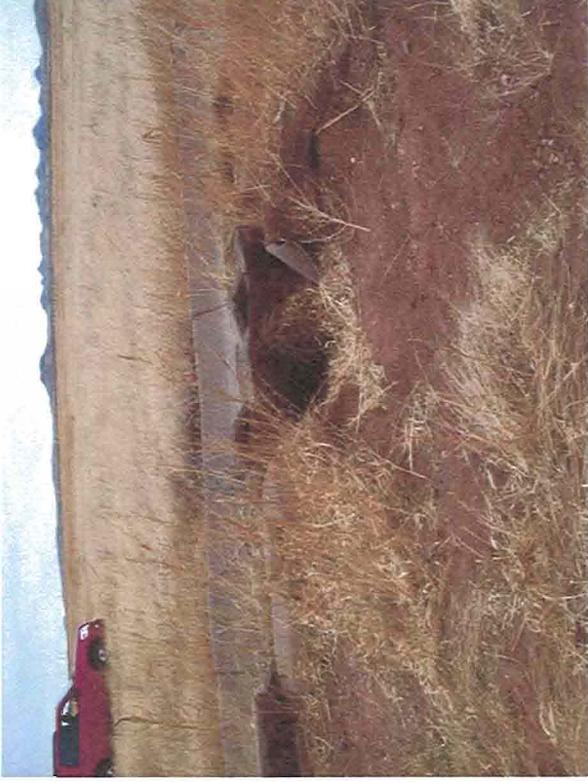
Concrete canal (photograph taken facing north in center of proposed project area).
